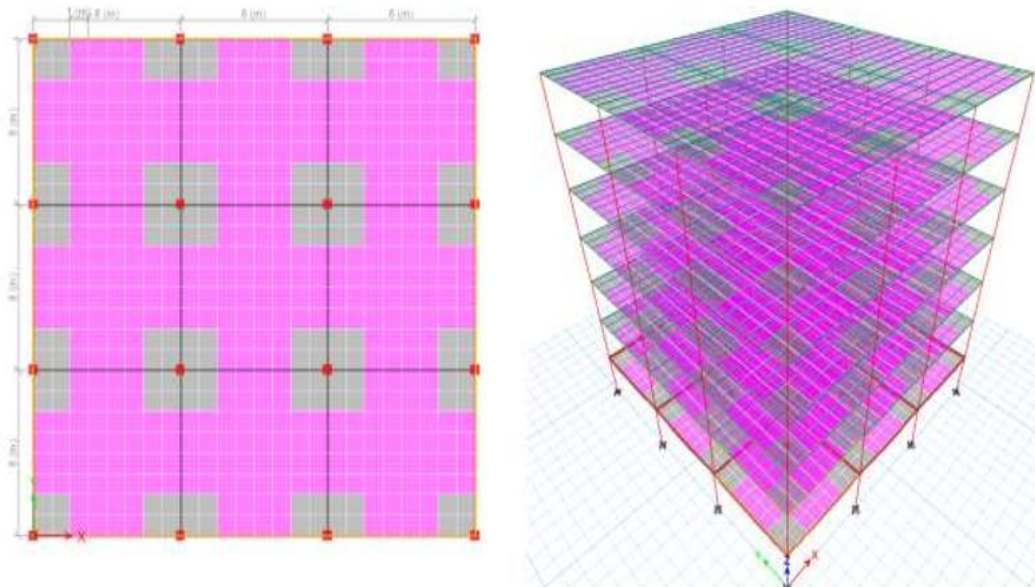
Snapshot of ETABs window of PT flat slab building
